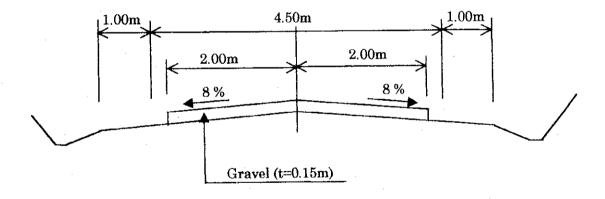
Cross Section of Access Roads and Village/Farm Roads
